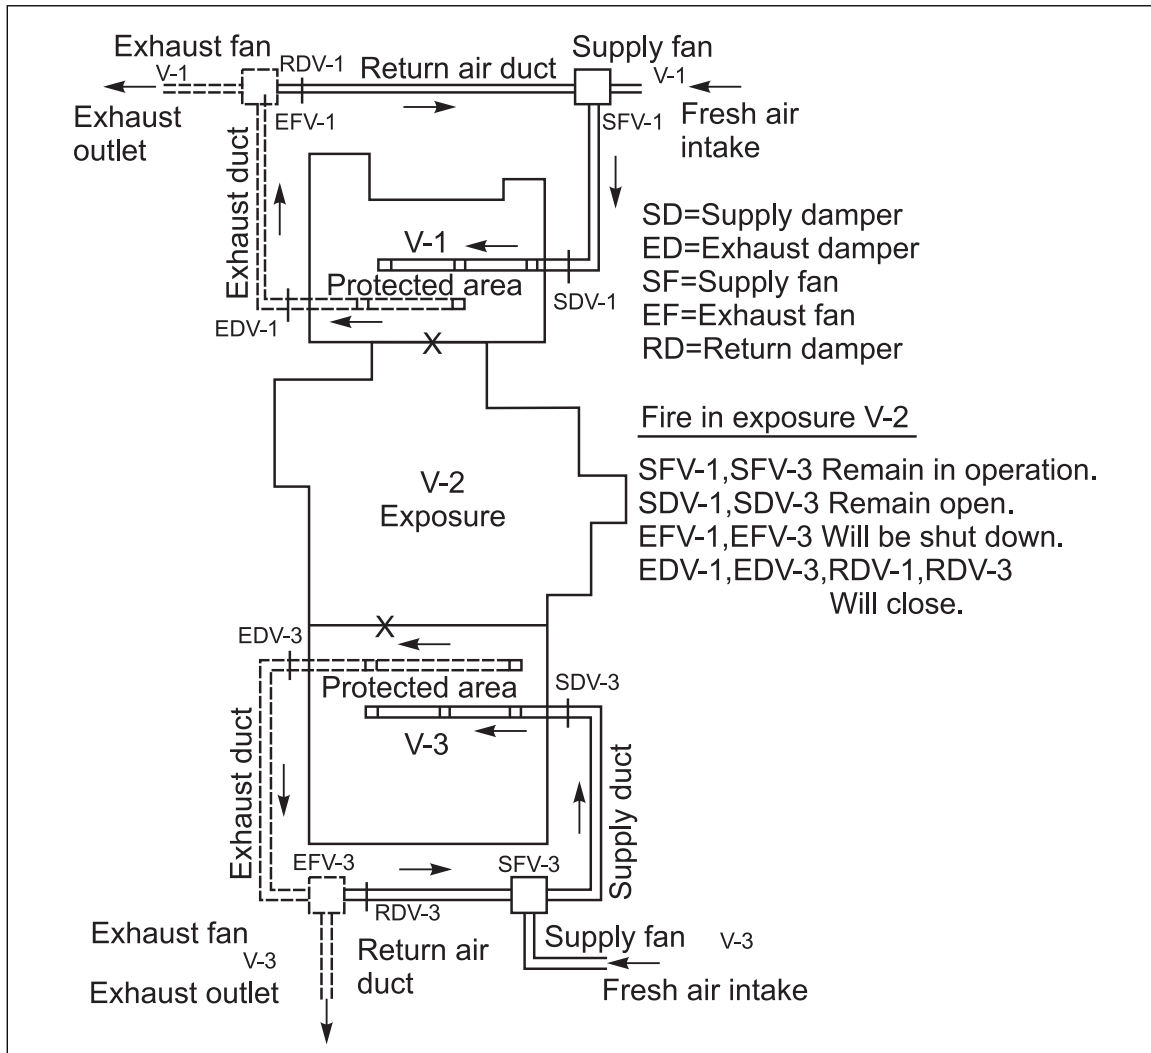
Typical smoke control arrangement by pressurizing the protected area (plan view)
